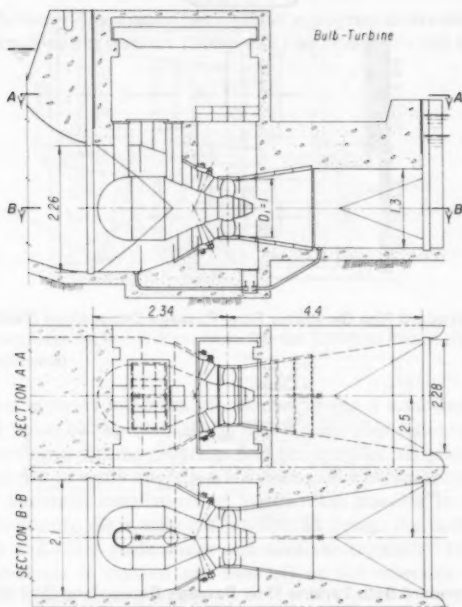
Standard Bulb Turbine Flow Passage Dimensions (Escher Wyss)
